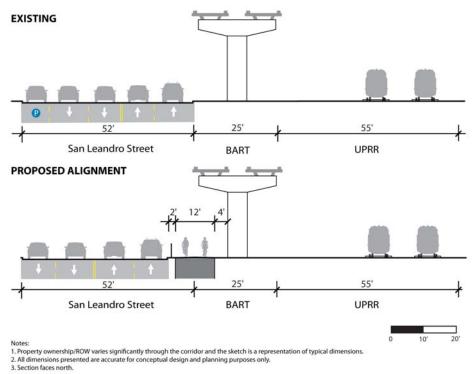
Proposed Segment 1.3 Alignment South of 54th Avenue
